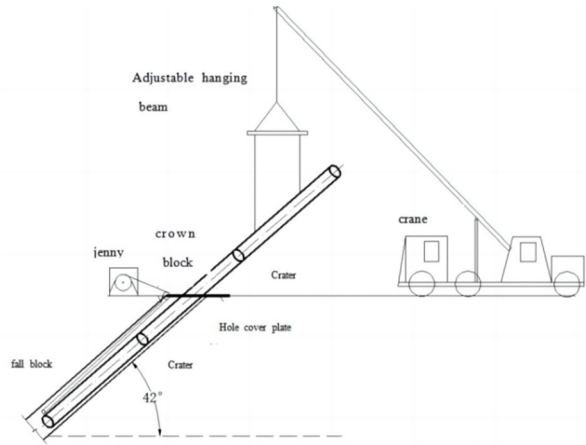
Schematic diagram of the traction device, welding, and slip pipe
